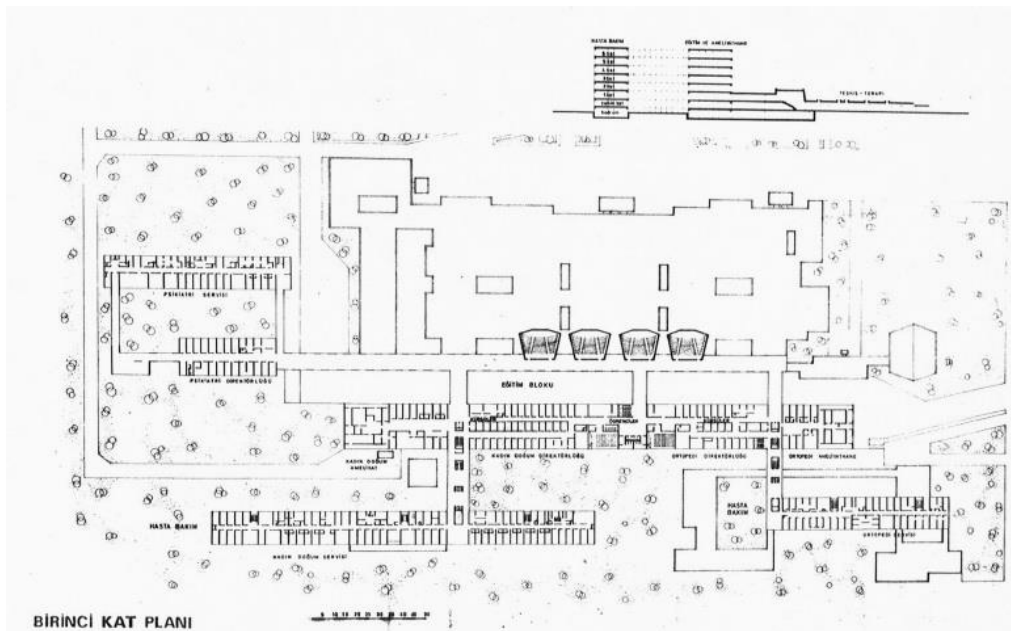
First Floor Plan, Ege University Faculty of Medicine Hospital
